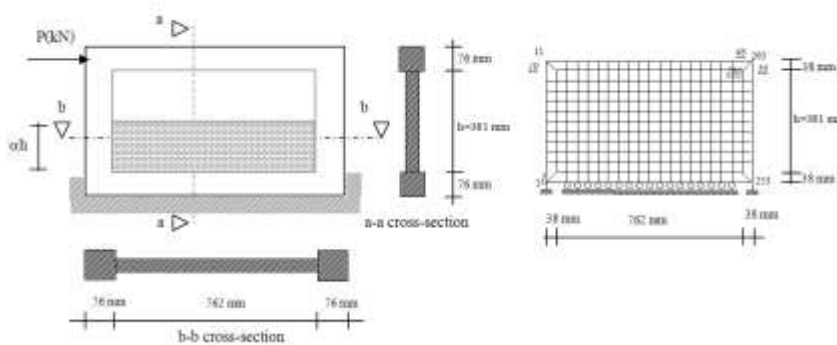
Frame-infill wall 1b. Mesh model of with full infill wall
